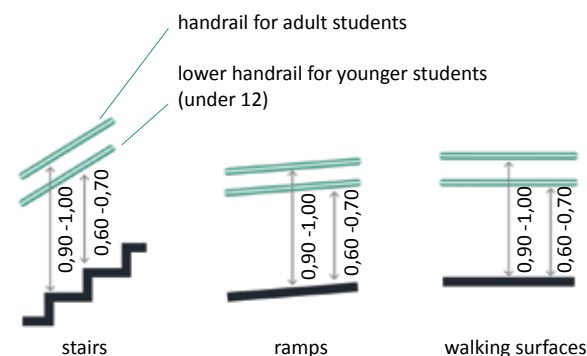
appropriate handrails height for stairs, ramps and walking surfaces
